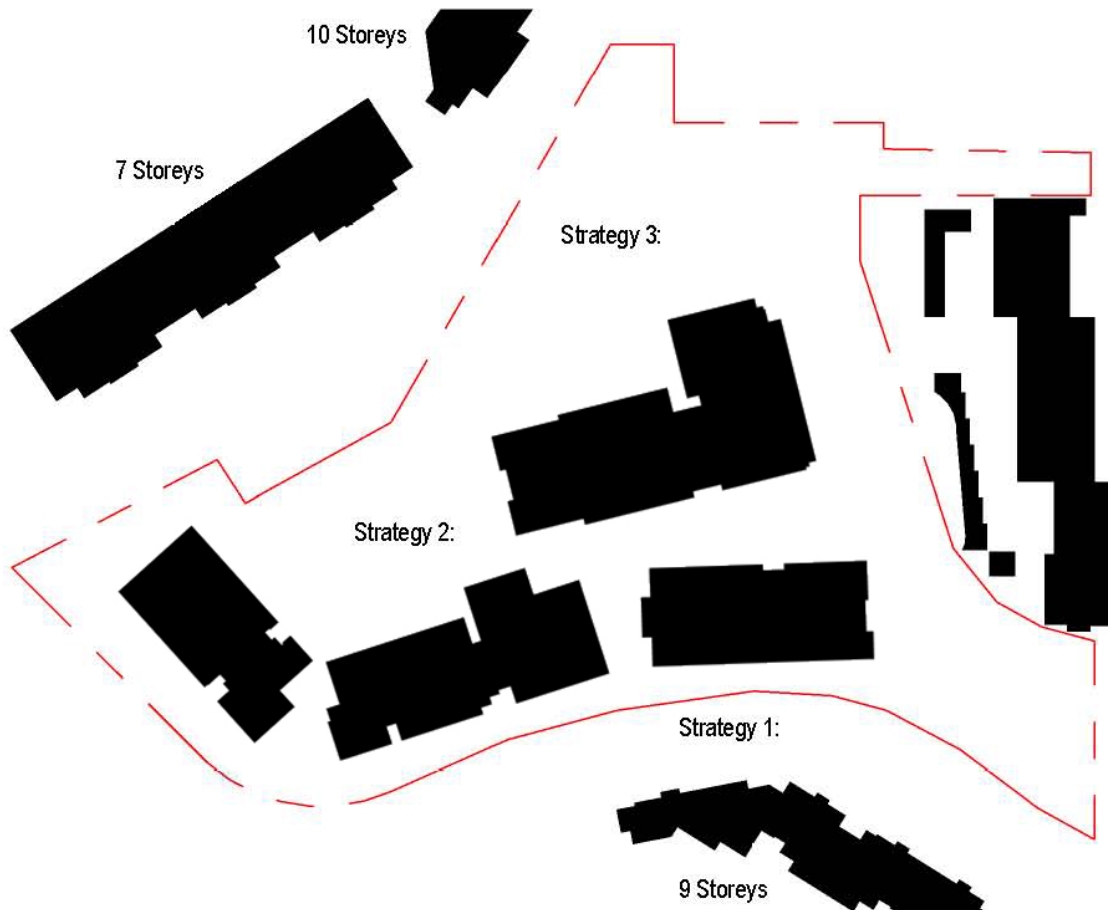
Figure Foreground Plan of proposal and neighbouring apartment buildings
